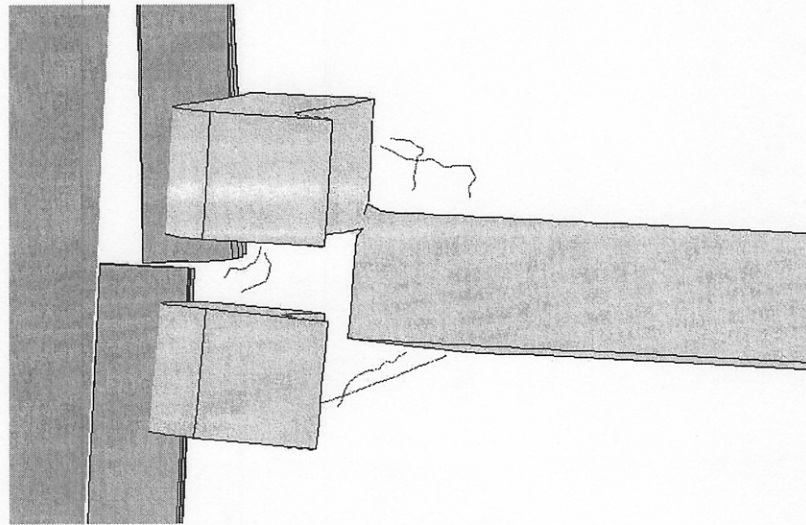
Failure of Cables Connecting Piles – Top View; 90° Impact
